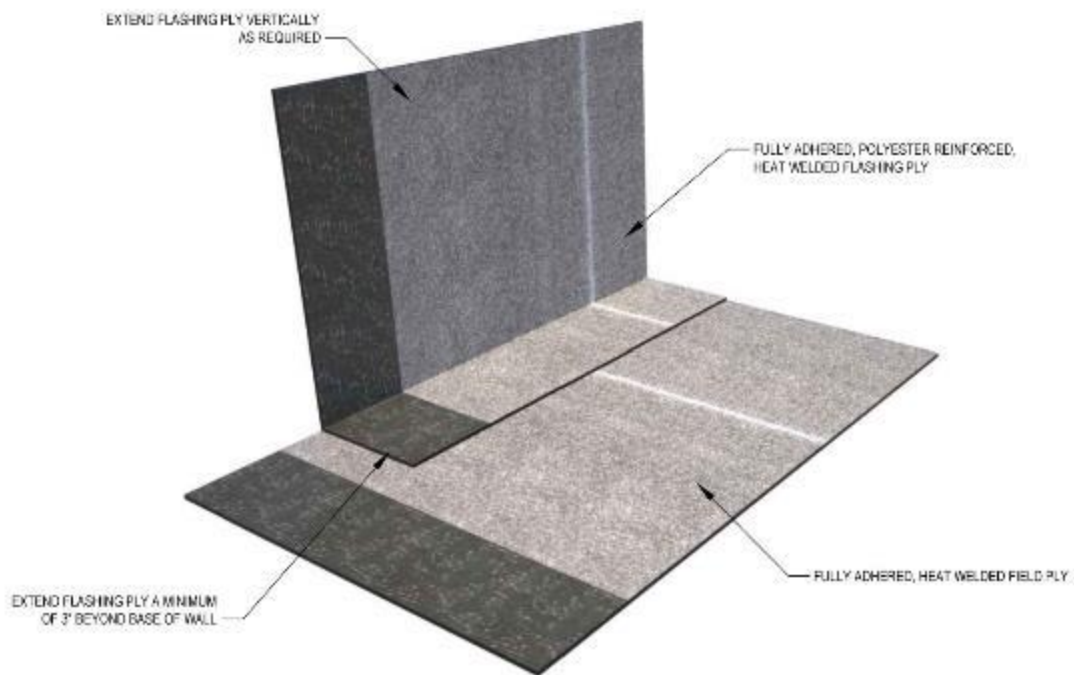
Fully Adhered, Heat Welded Vapor Retarder Flashing at Wall/Curb Without Cant
